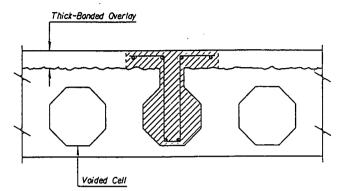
Hollow tube slab, with thick bonded overlay (Kansas DOT).
